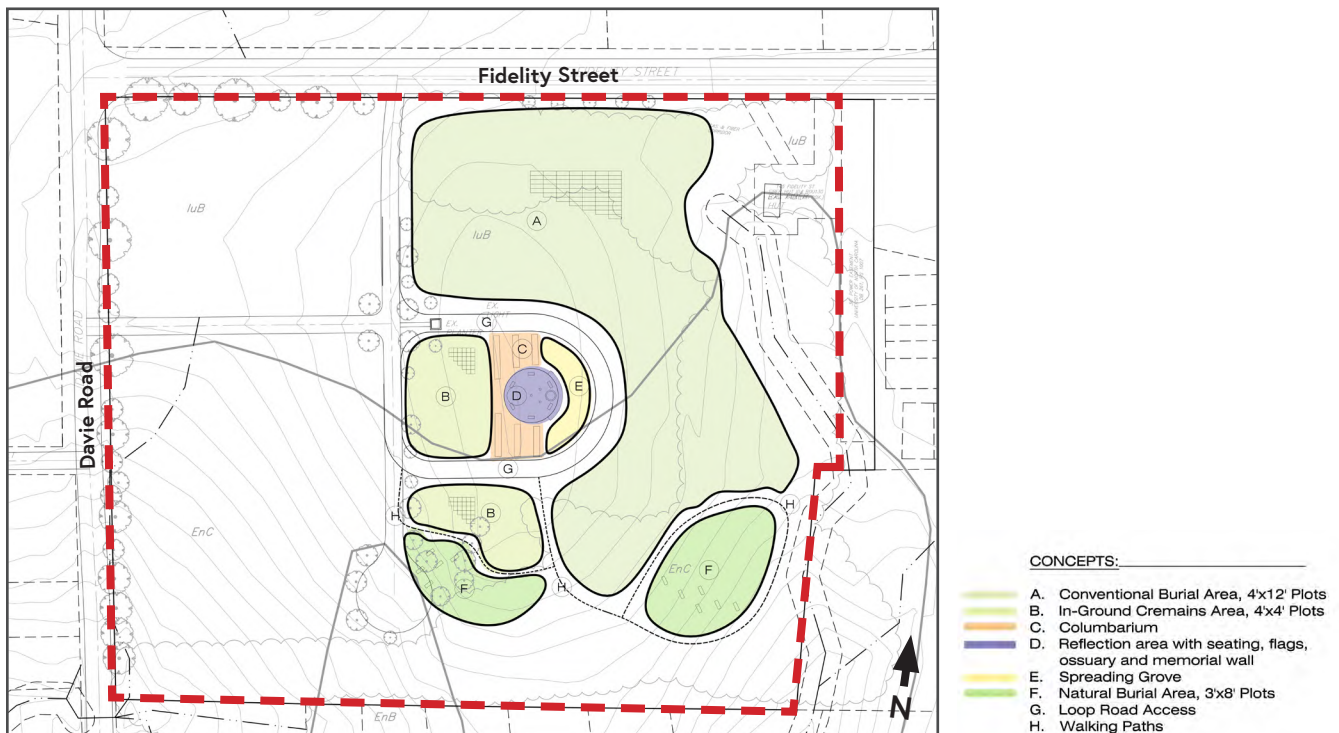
Concept Plan showing proposed land uses and site layout. (CVDA)
